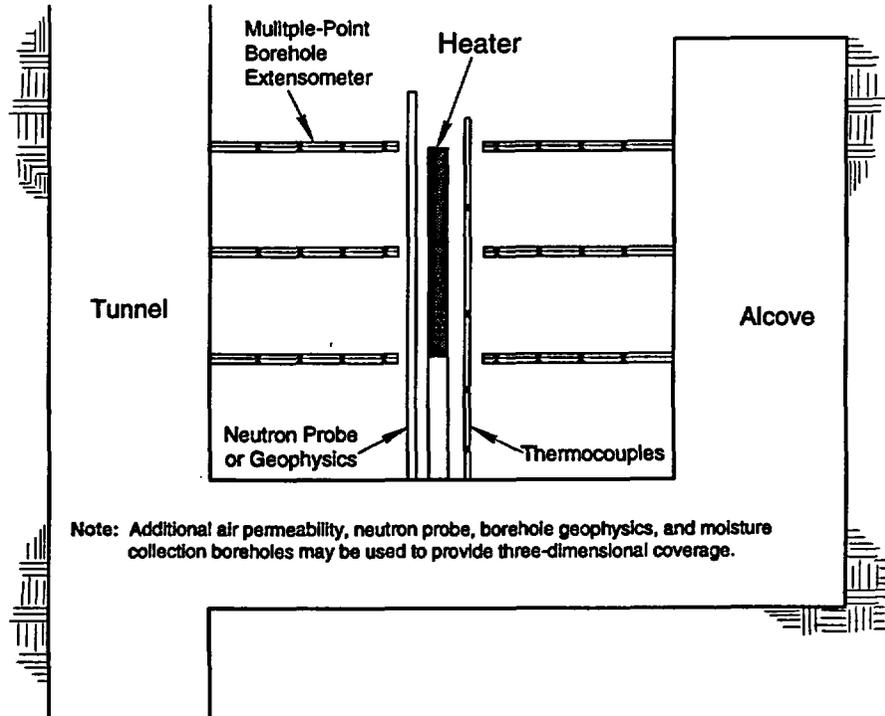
Conceptual layout for the single-element heater test—horizontal configuration, plan view.
